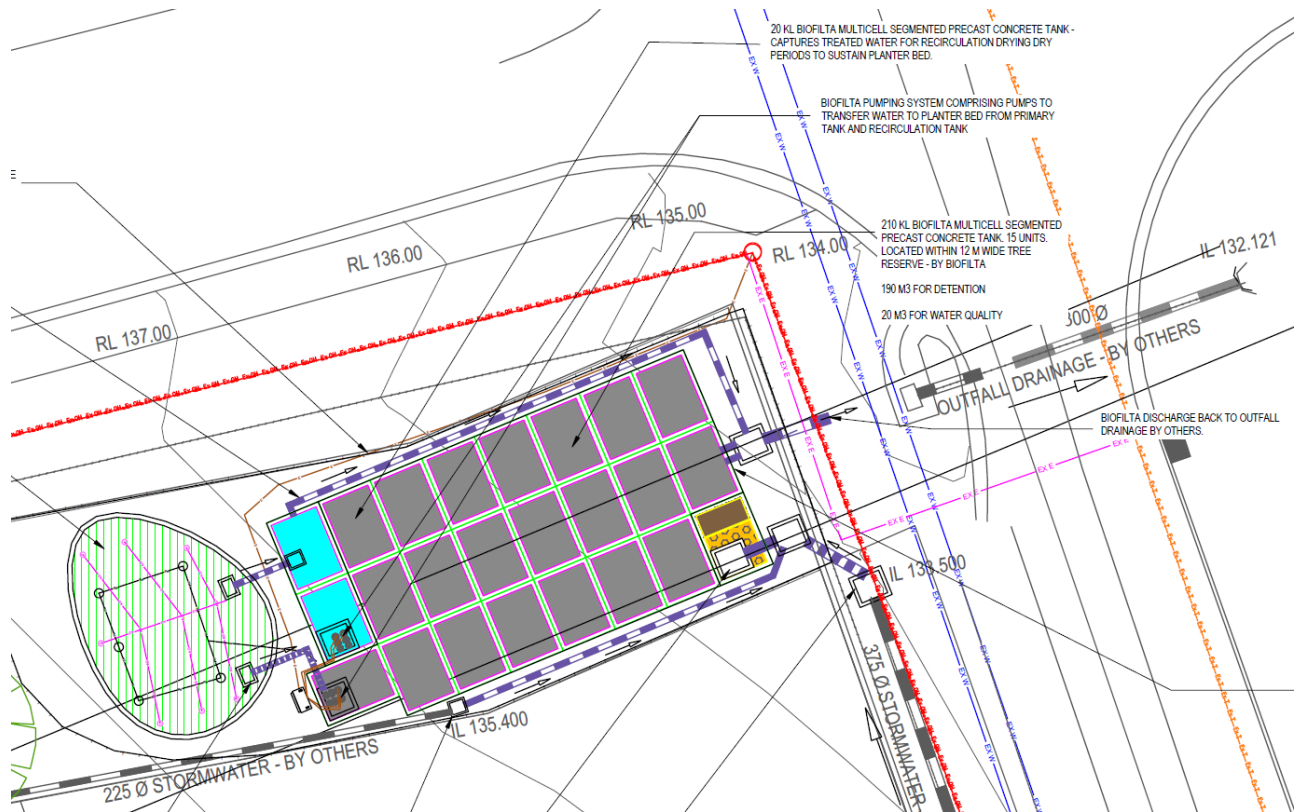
Drewan Park Stormwater Treatment and Reuse location
